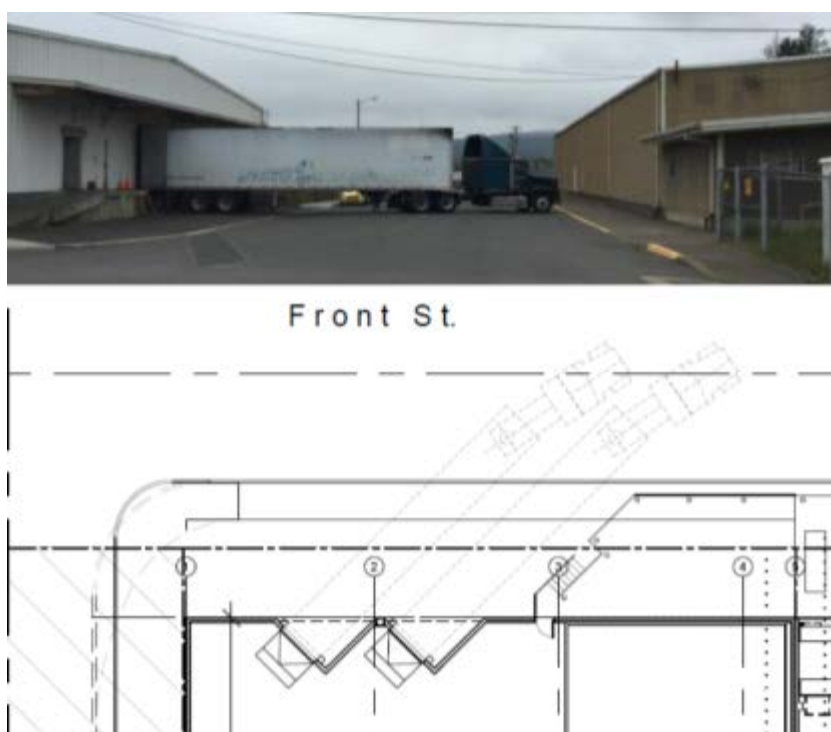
Saw-tooth parking for truck un/loading along Front Street
